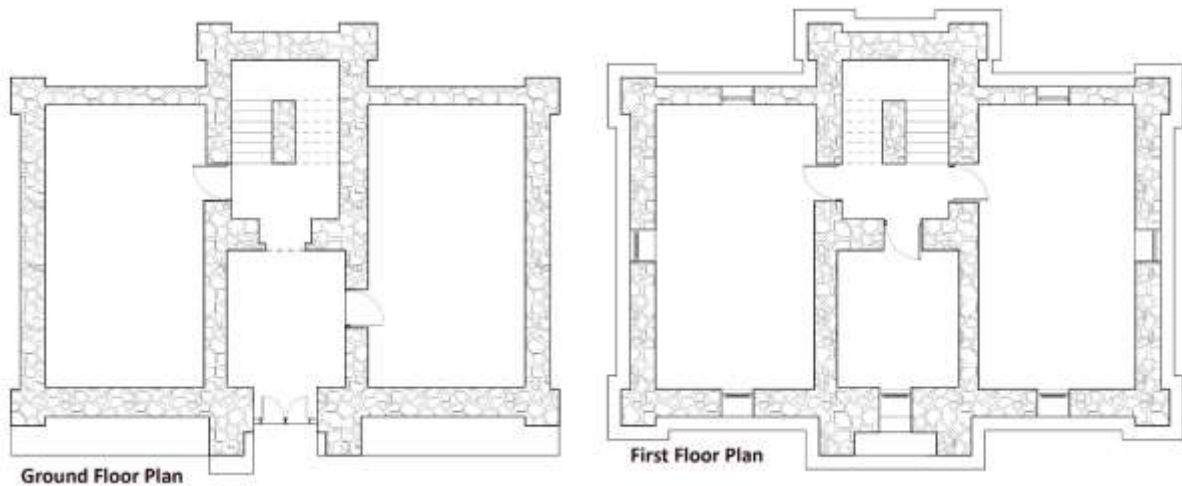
Enda Medhane Alem artifact storage "Eka Bete" floor plan
